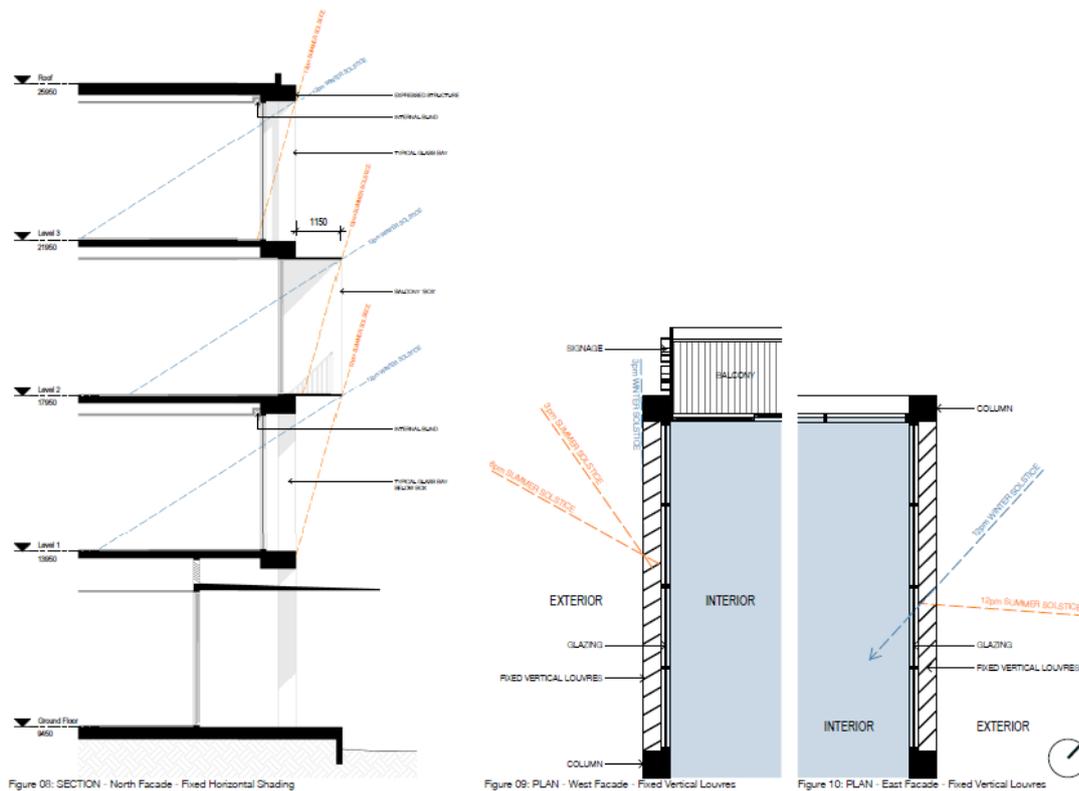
Facade section and plan details showing fixed horizontal and vertical shading.
